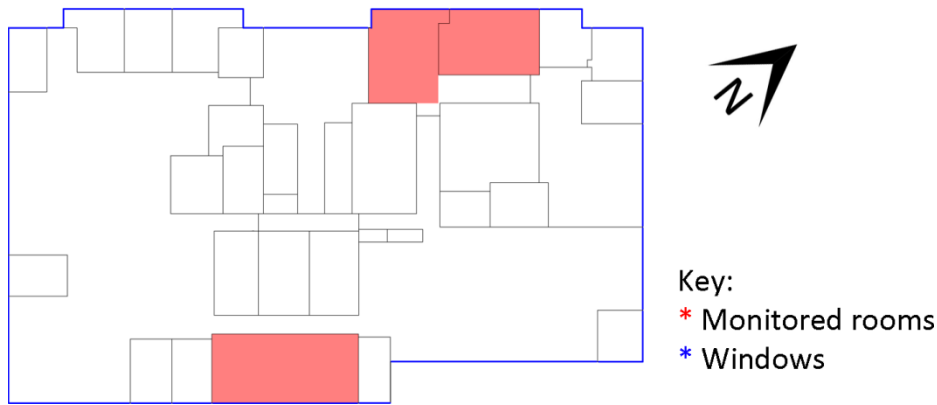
Floor plan illustrating level 2 in Building 1 (Not to scale)
